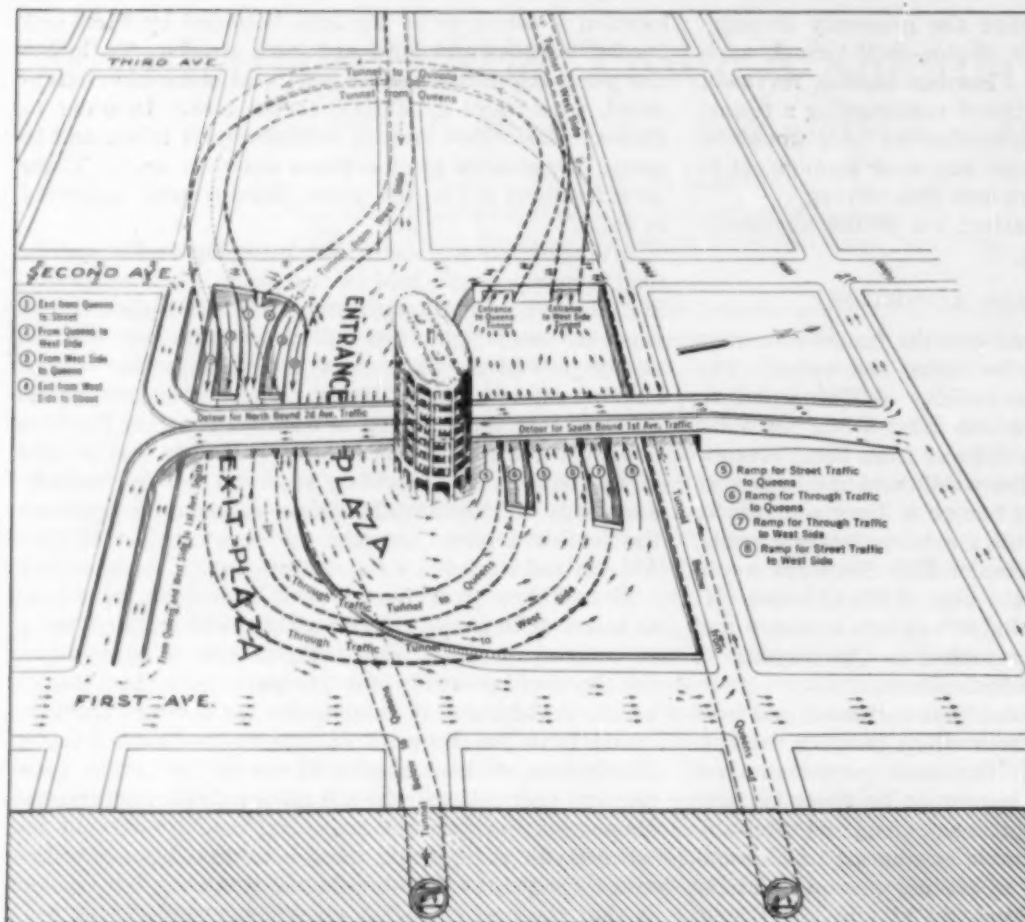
PERSPECTIVE SKETCH SHOWING PROPOSED EAST SIDE PLAZA, LOOKING WEST
